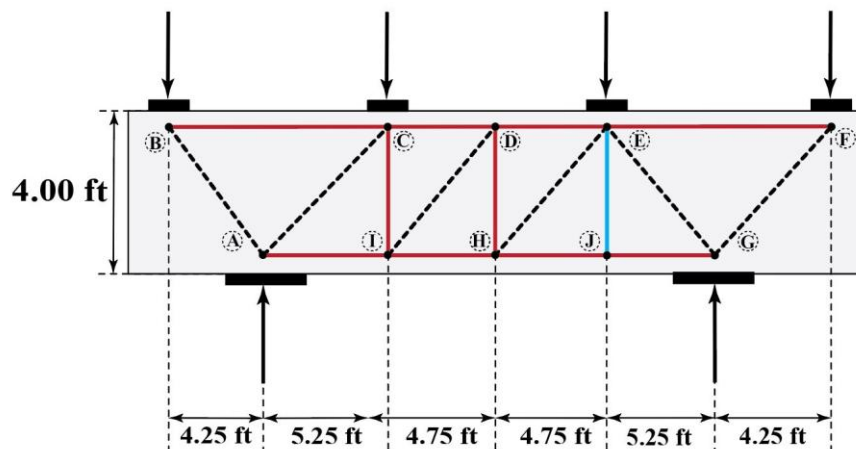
The typology considered for Two-Column Skew Bent Cap and Section (Ref: Project No. B-4499, Davidson County, Sheet No. S-22).
